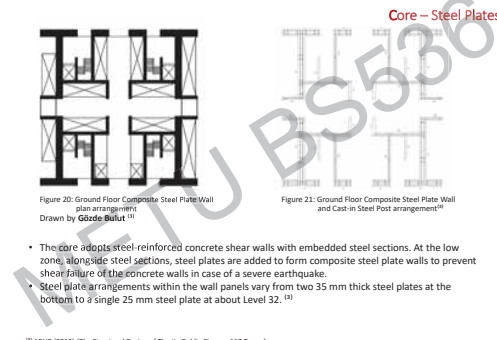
Ground Floor Composite Steel Plate Wall plan arrangement
